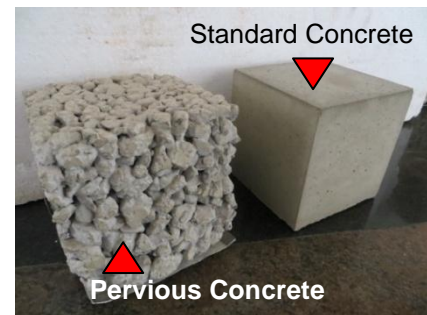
, 2 & 3: Samples of Standard Concrete & Pervious Concrete
